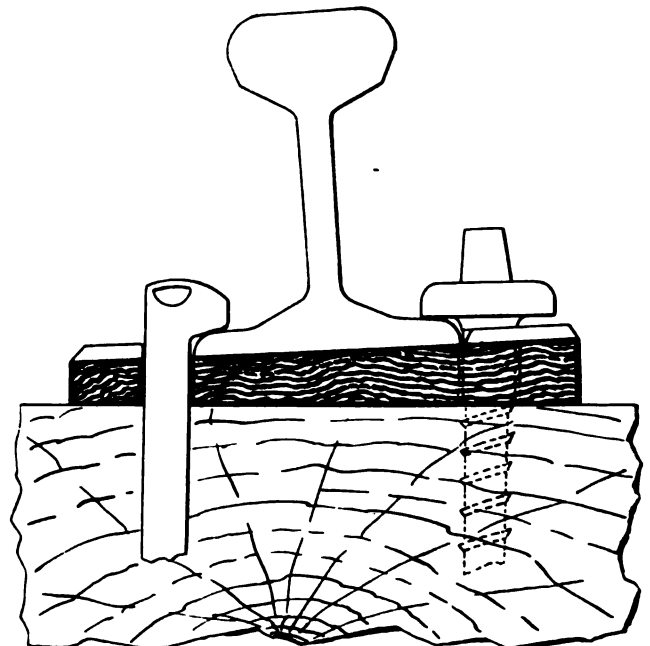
Cross-section of rail and armoured plate fixed to sleeper.
